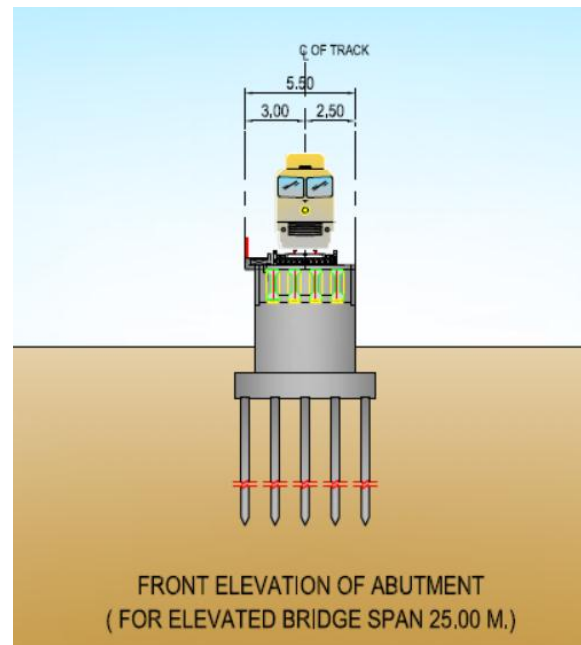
The Bridge Structure of Pre-Stressed Concrete Slabs
